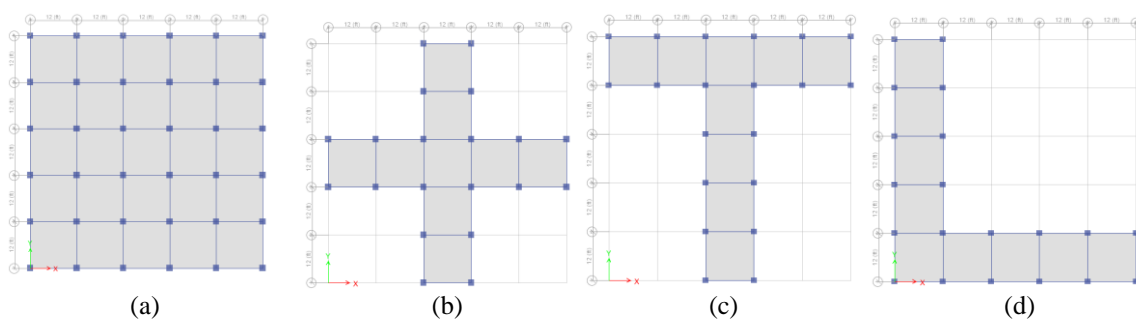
Plan view of G+20 buildings (a) Square shaped (b) Plus shaped (c) T-shaped (d) L-shaped
